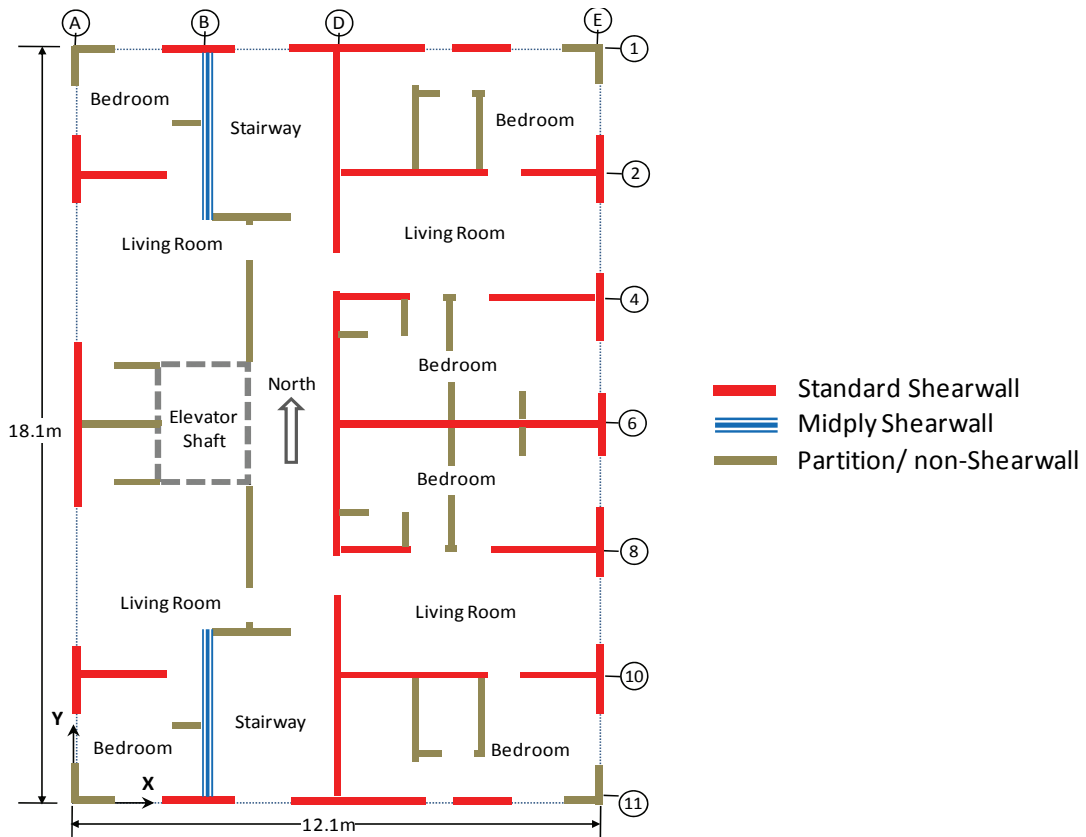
Plan view of the six-story NEESWood Capstone Building for 2nd to 5th floors.
